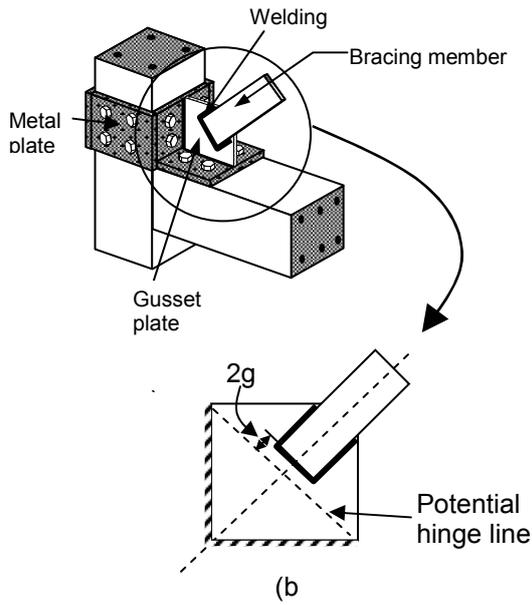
(a) Brace connection details (b) Gusset base connection detail
